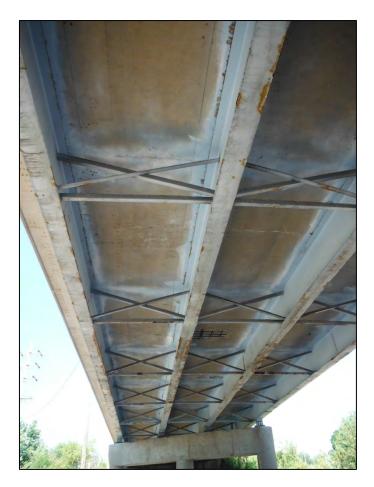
Looking north over the westbound lanes at deck spalling.
